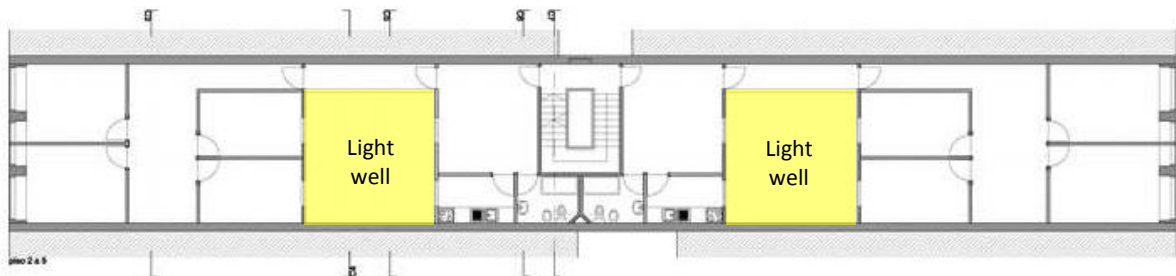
20- Typical Floor Plan of a Porto Housing Building
